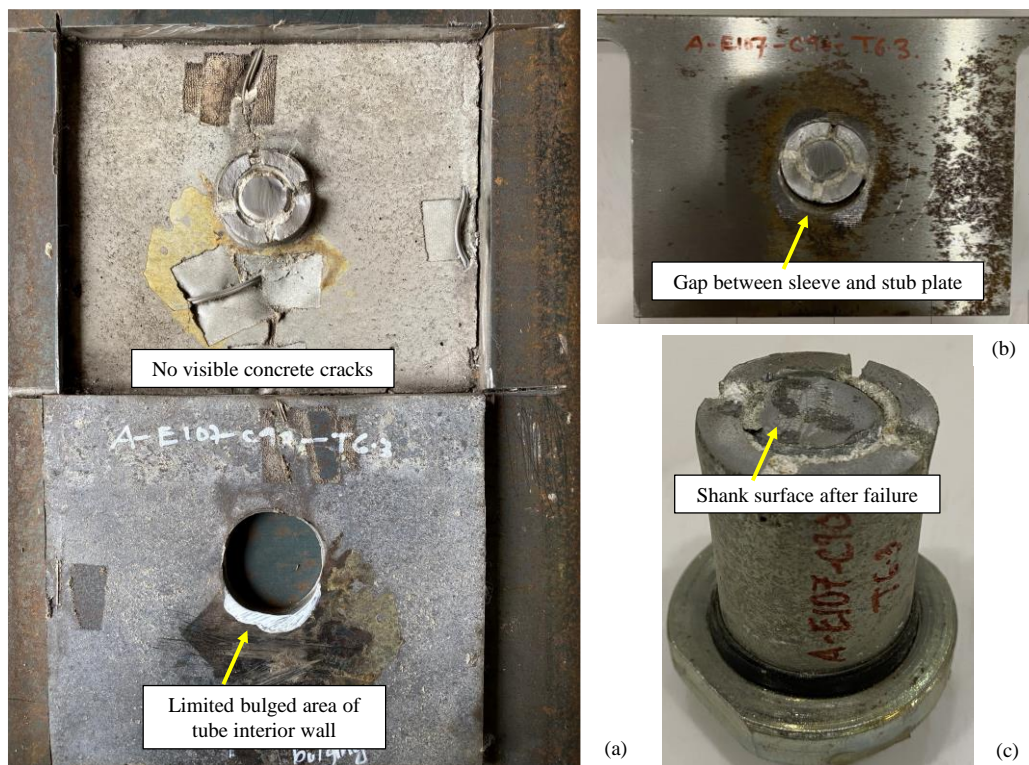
Specimen A-E107-C80-T6.3 (a) Concrete and tube wall surfaces; (b) bolt part attached to stub plate; (c) shank surface after failure.
